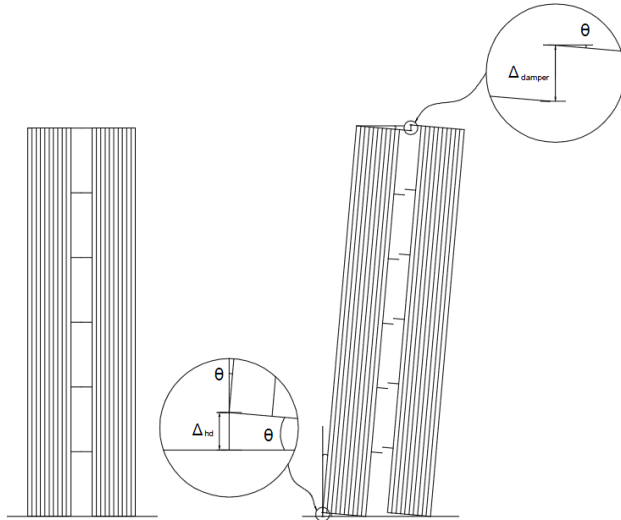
Kinematic mechanism of rocking shear walls with coupling beams
